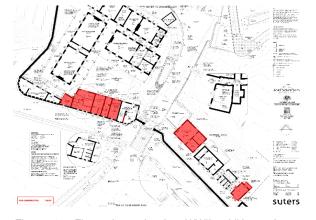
Floor plans showing WWII additions. A new guardhouse and generator room were constructed to the east of the gates. The Old Guardhouse was extended to the west and a new rations block was constructed between the NCOs' Ablutions and the Old Guardhouse. Internally, a new wall was inserted in the Old Guardhouse separating the southern cell from the main room. (Source: Gate/Courtyard Floor Plans Lower, 2005, Suters Architects)
